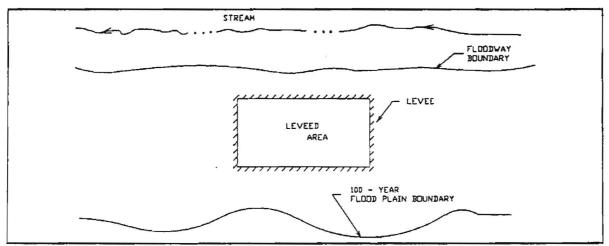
Typical Layout of Levee Entirely Within Flood Plain
